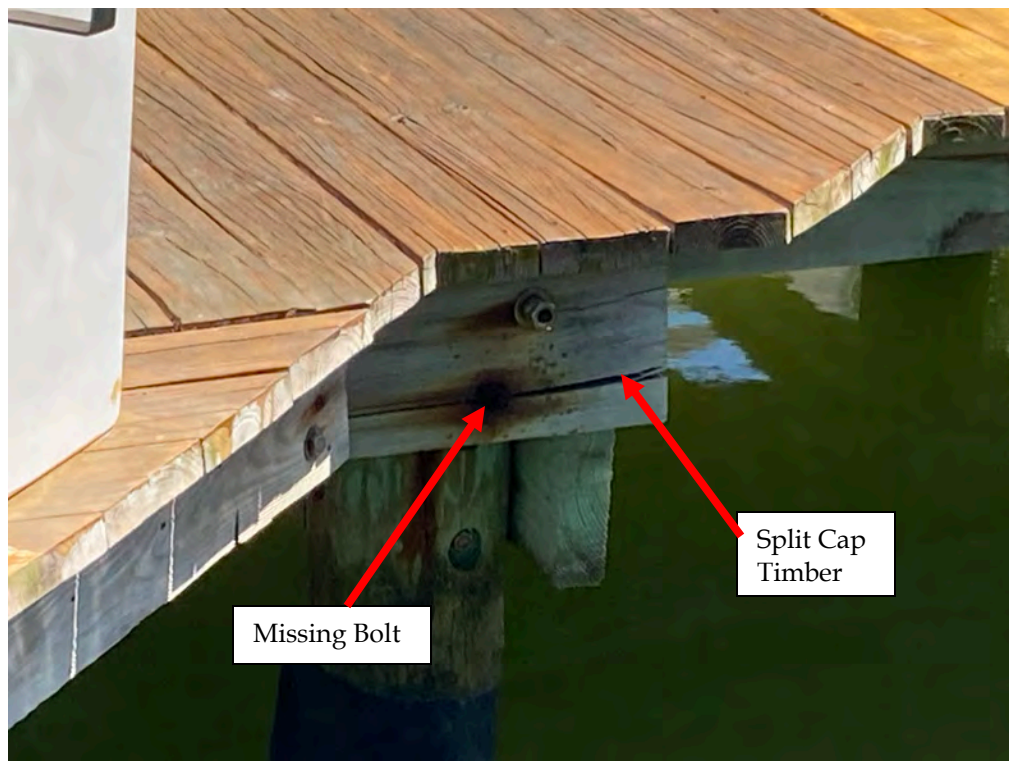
Dock Framing – Split Lumber and Missing Bolt
